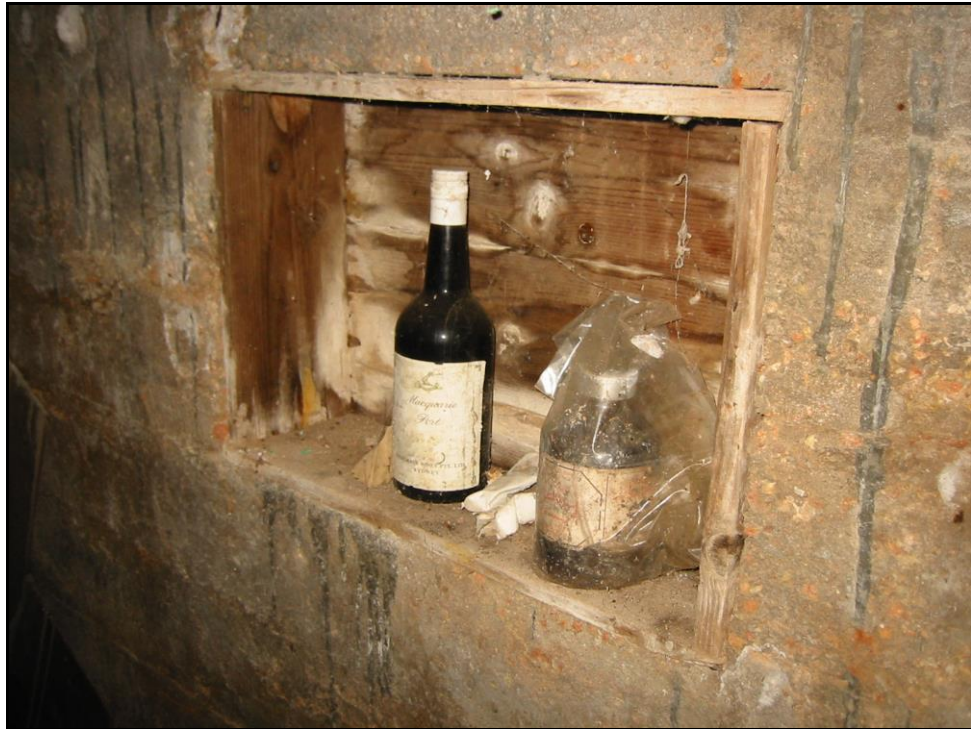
Detail of shelf in eastern wall, Pierce Type V shelter (Wimmer 2009)
